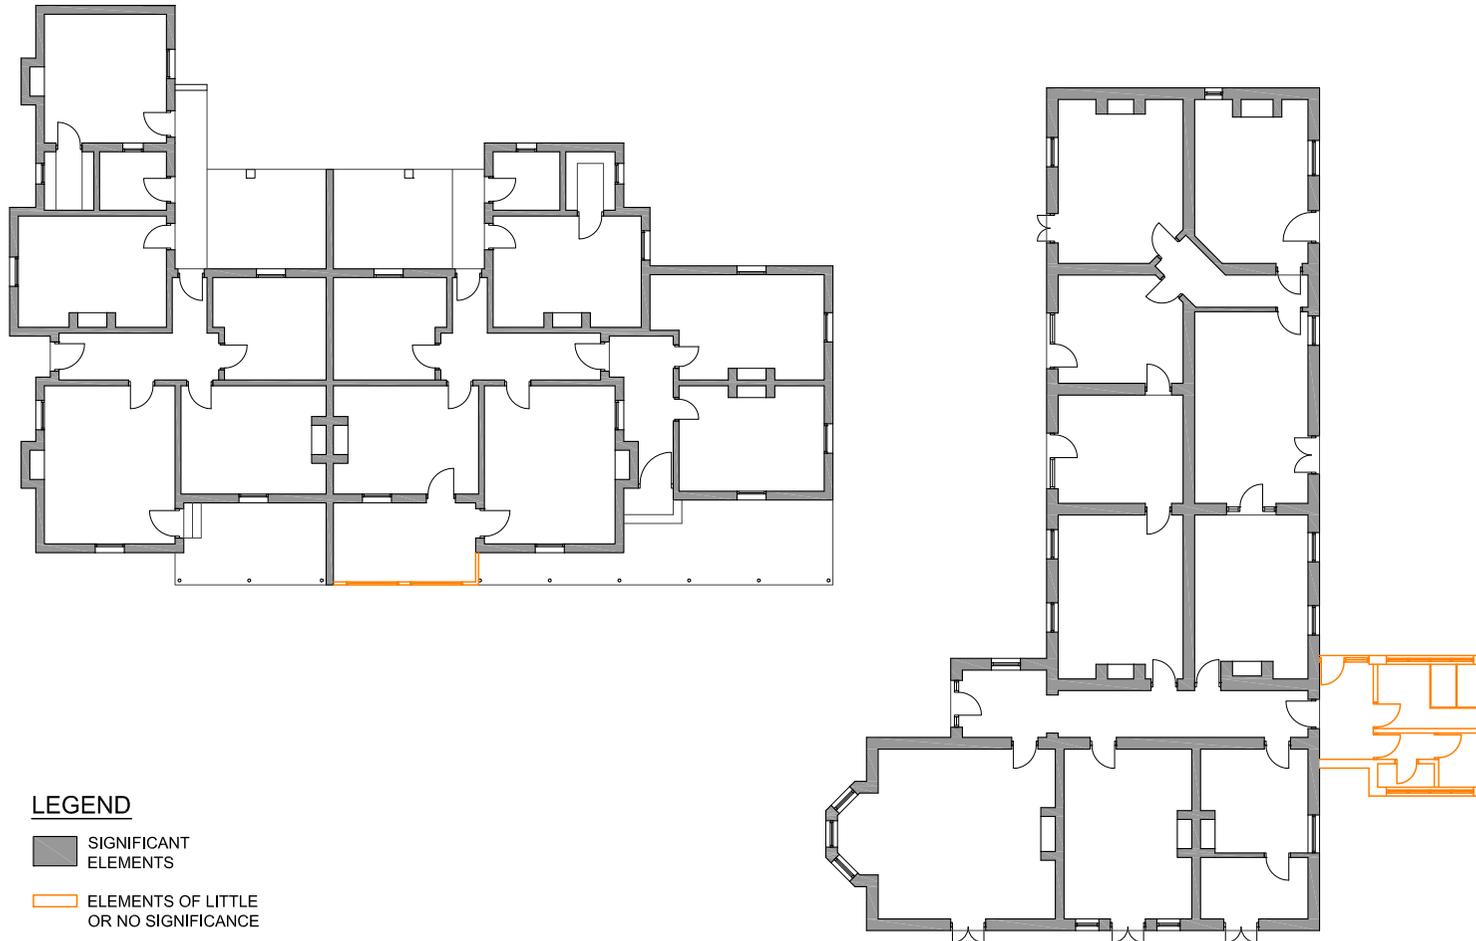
A - WARDEN'S DUPLEX AND MARGARET HOUSE
